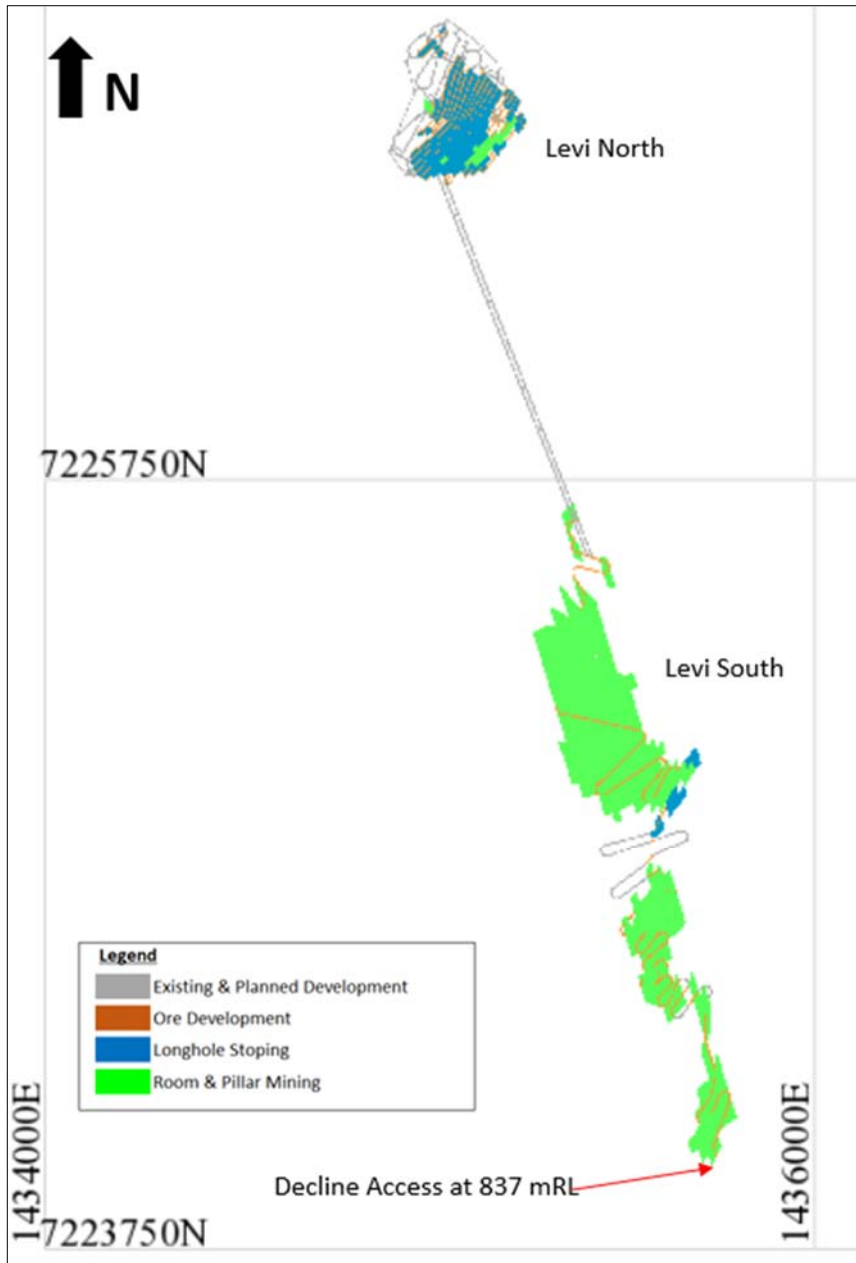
Plan view of the Levi Mining Inventory by mining method and existing and planned development
